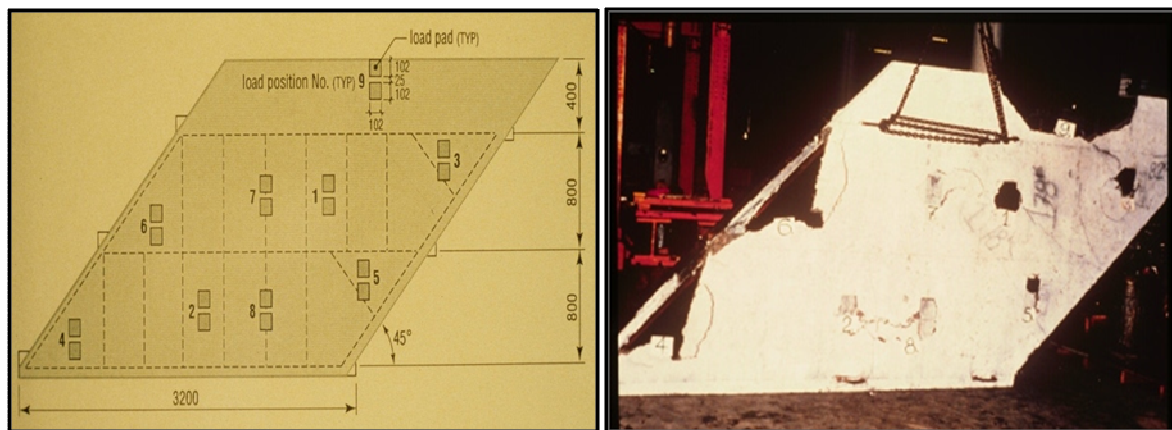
A half-scale model of a skew deck slab on three girders showing the flexural mode of failure consistent with yield line theory at test position no. 9 (Bakht & Agarwal, 1995)
